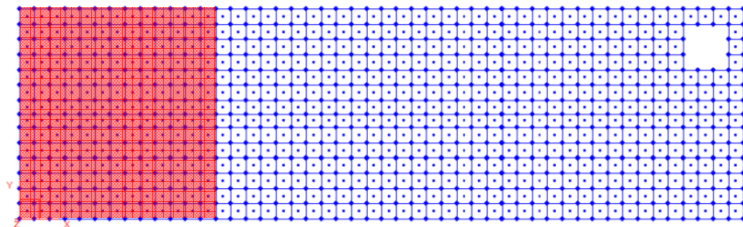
Typical Raft Slab Model of the Reinforced Concrete Raft Slab (Lafarge Lake – Douglas PPS Case is shown above)
